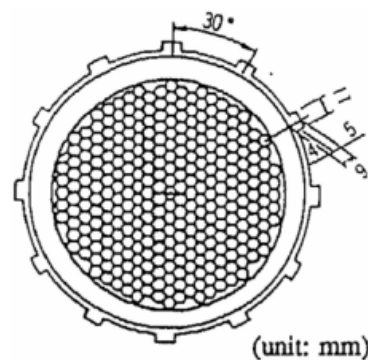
Cross section of the cable used for the Higashi-Kobe Bridge
